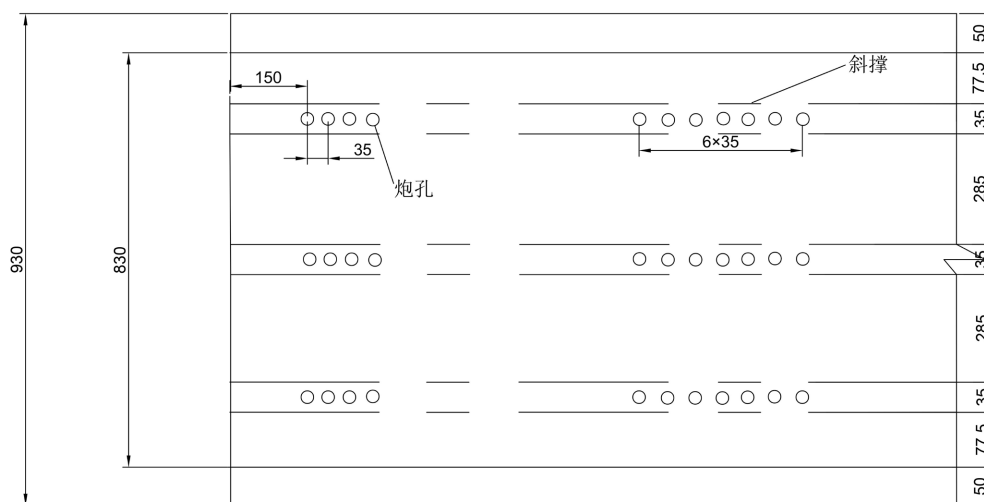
Layout diagram of boreholes on the deck of Overpass No. 5 (Unit: cm)
